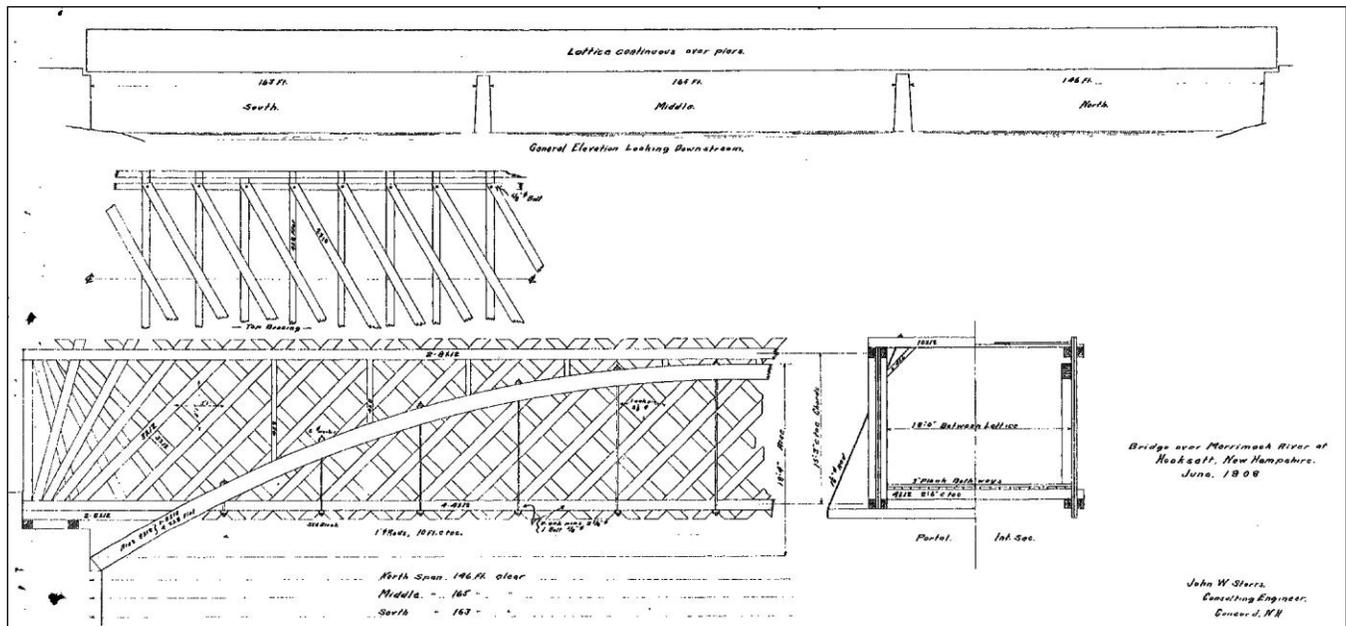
Inspection drawing of Hooksett Covered Bridge made by John Storrs for Town of Hooksett, June 1908 (Hooksett Heritage Commission).
